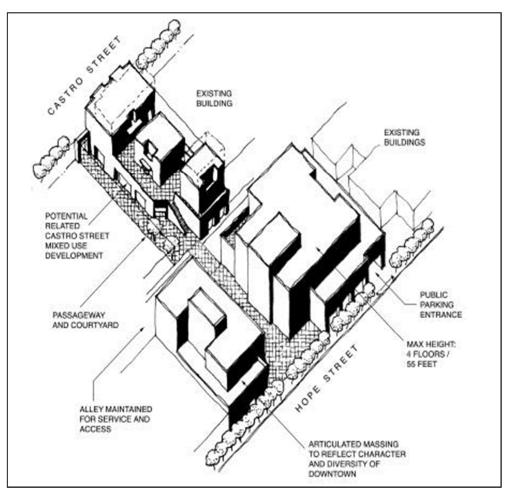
Mixed-Use Parking Lot Infill Prototype
